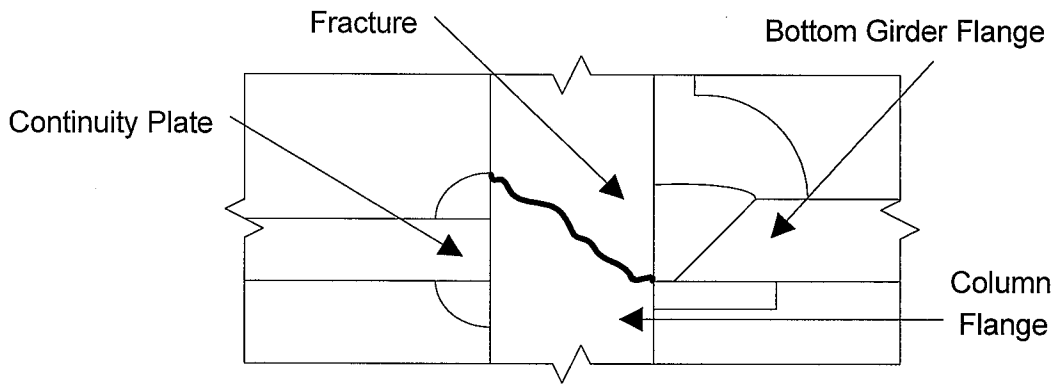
Damage Type C4 (Column Flange Fracture)
